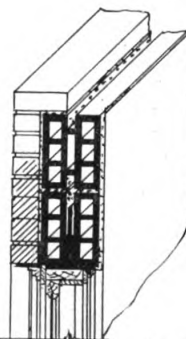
Section of window opening of wide span, showing head construction. The tile span is carried on either a T iron or on two angle irons set back to back. Or the blocks forming the head may be reinforced with steel rods embedded in concrete. Keyed arch tile may also be used.
